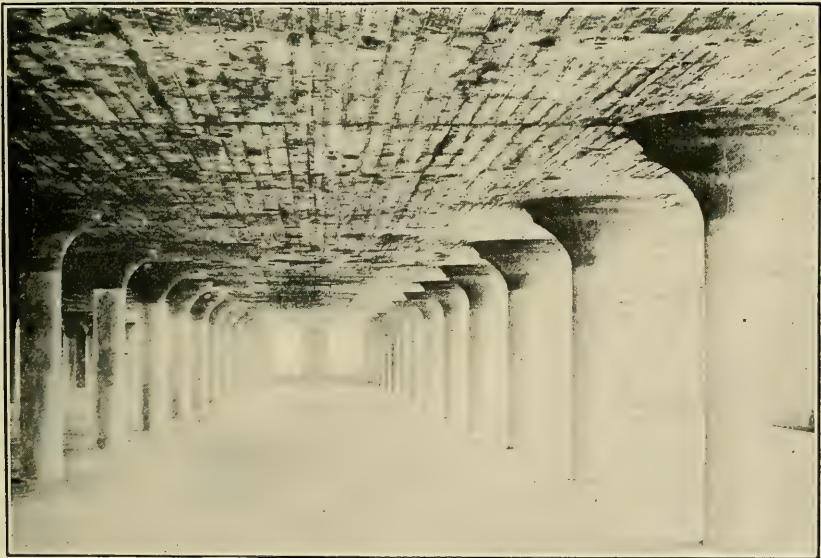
INTERIOR VIEW OF A FLAT SLAB DESIGN OF REINFORCED CONCRETE.
